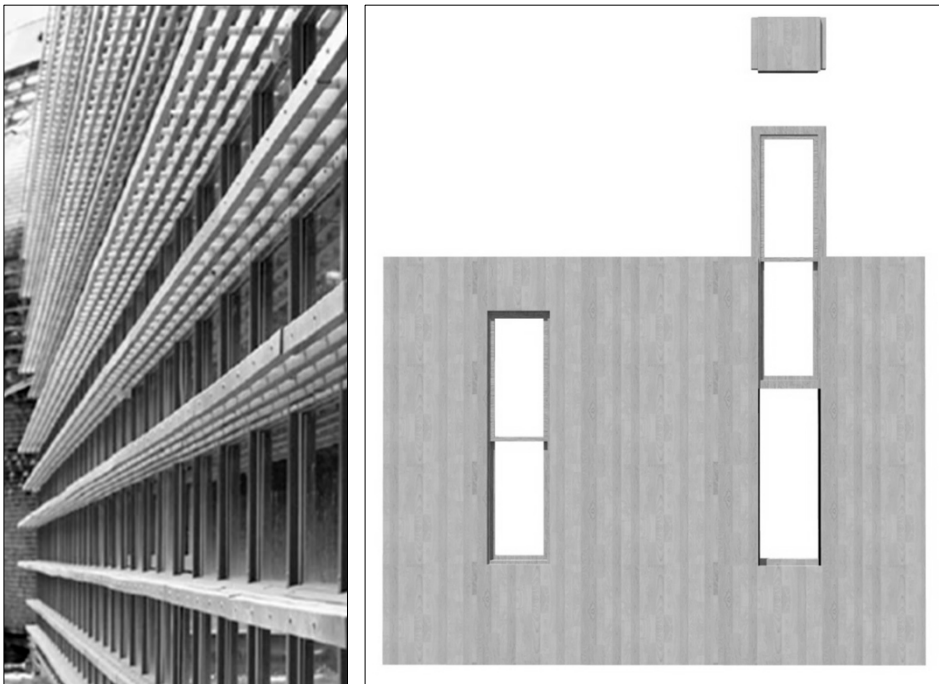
and 16. Picture of the realized WNF façade renovation and the calculated office façade renovation with minimal embodied land (source: vd Meijden).
